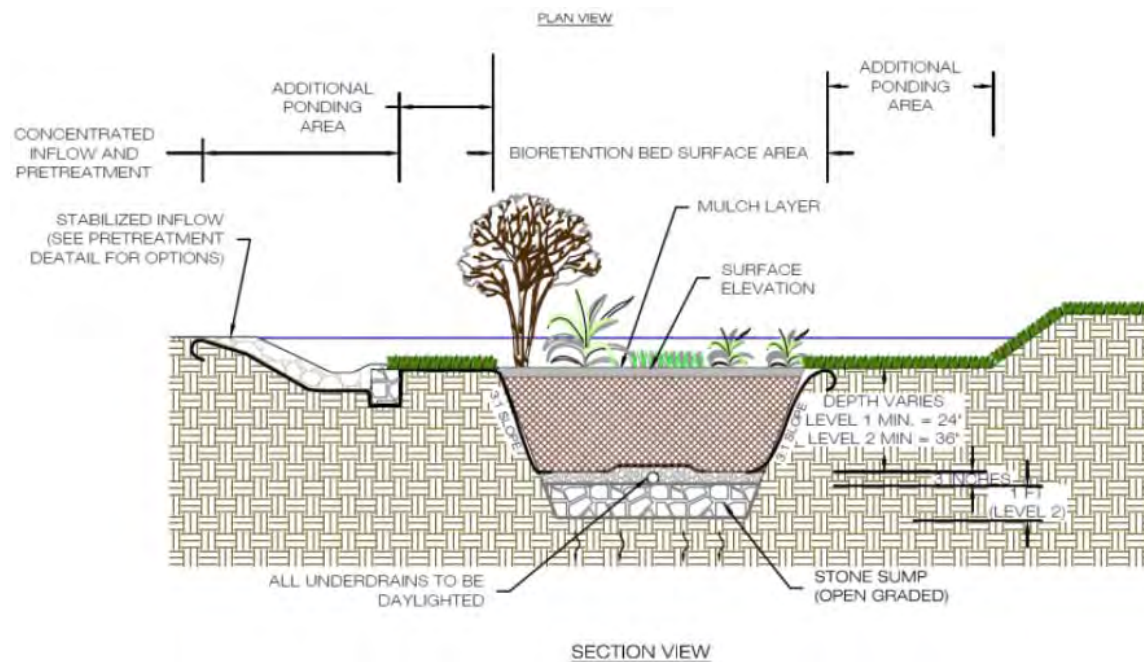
Typical Bioretention Detail with Additional Surface Ponding (Virginia DEQ 2011c)
